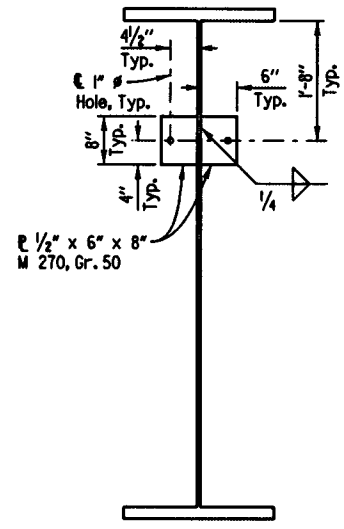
DETAILS OF FIELD ERECTED SAFETY HANDRAILS
